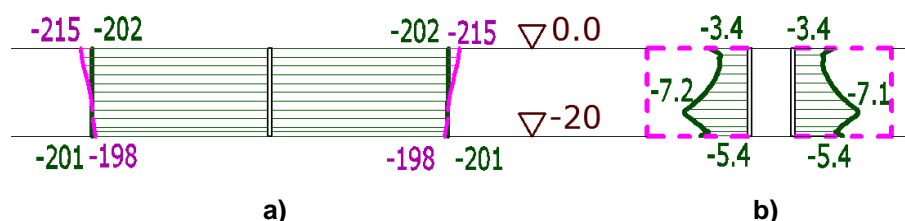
Wall SSS in alternative IC-5 for the moment of the dam construction completion.
